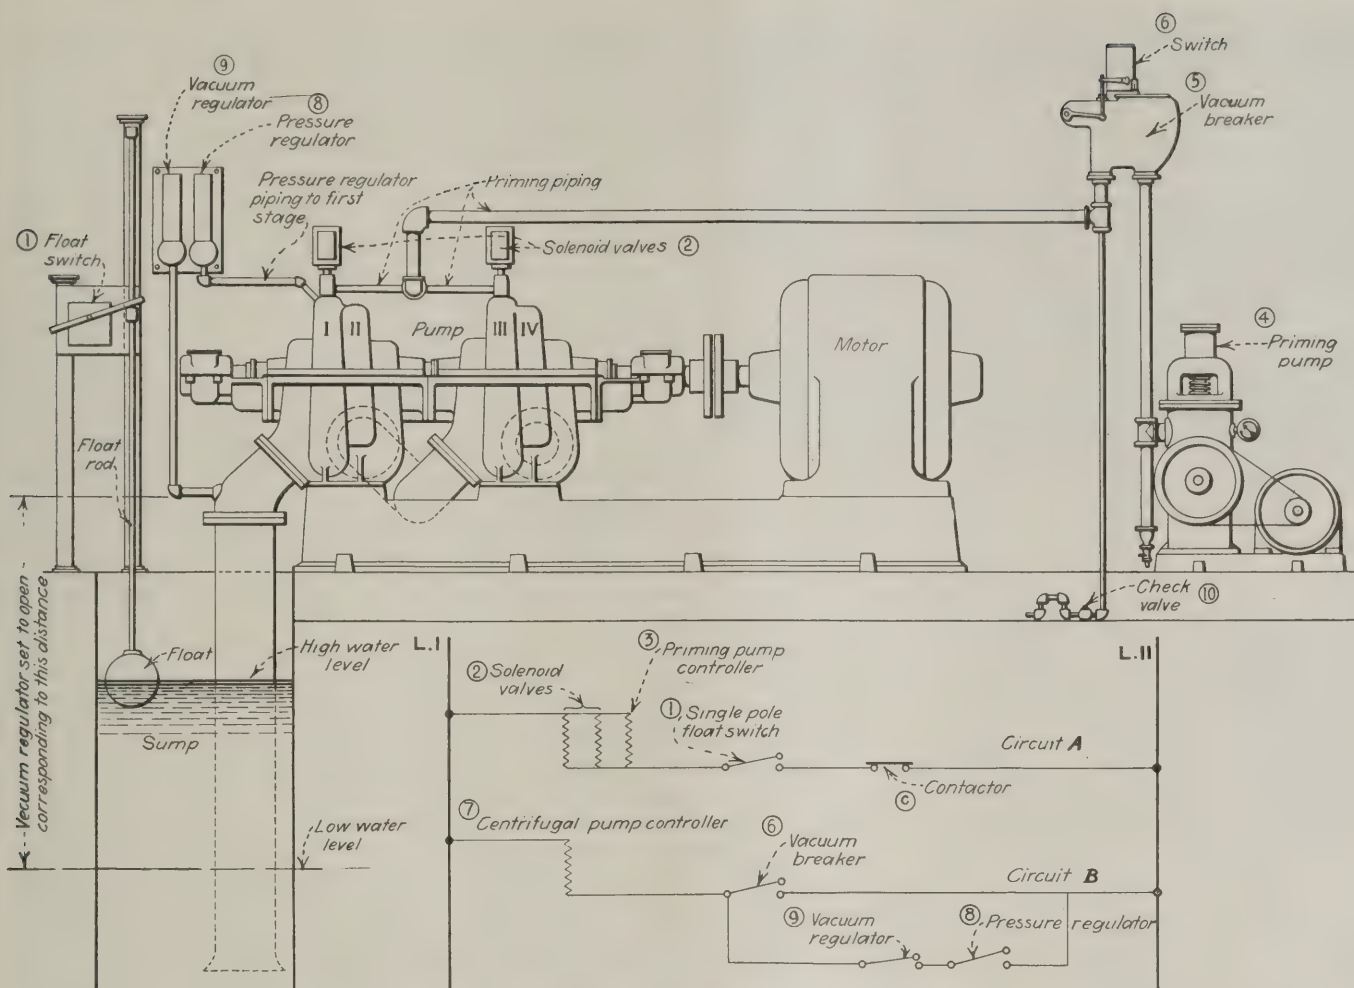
PUMP LAYOUT AND CONTROL WIRING
